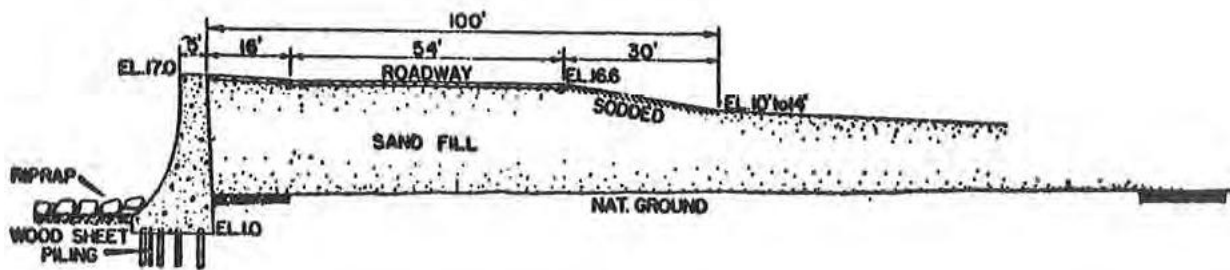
The seawall as originally constructed, and completed in 1904. (US Army Corps of Engineers)
